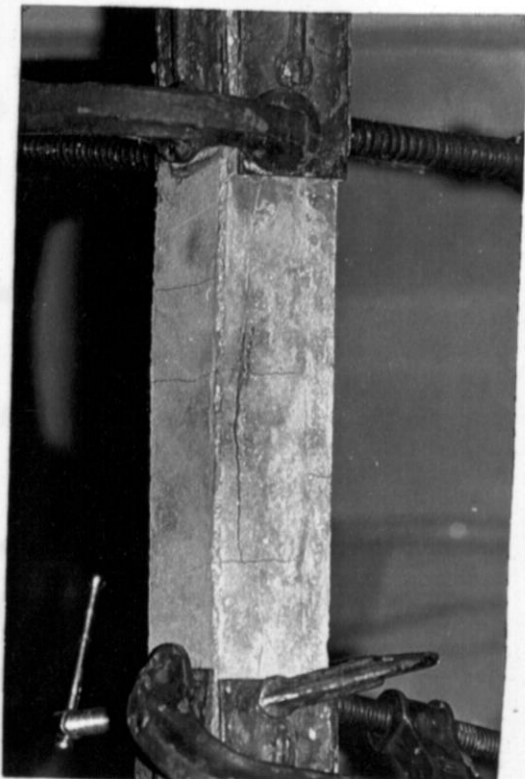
Multiple cracking in flexure test (parallel aligned reinforcement).
